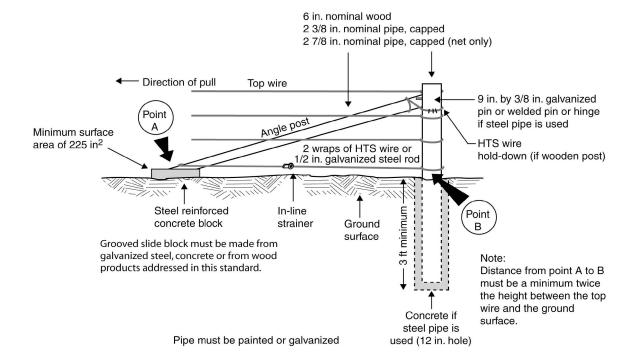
"H" BRACE AND SINGLE POST PULL ASSEMBLIES
